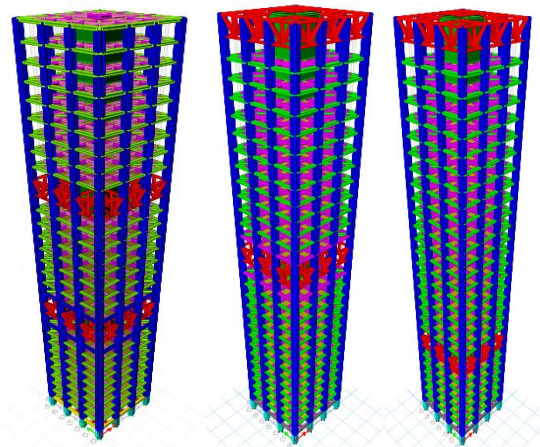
Two outriggers @ 0.33 and 0.66 height of building, 2.Two outriggers @ Top and 0.5 height of building, 3.Two outriggers @ Top and 0.75 height of building.
